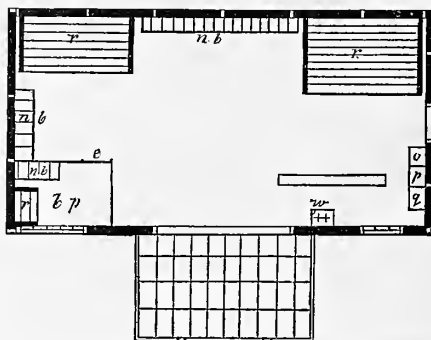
GROUND PLAN OF POULTRY HOUSE.
